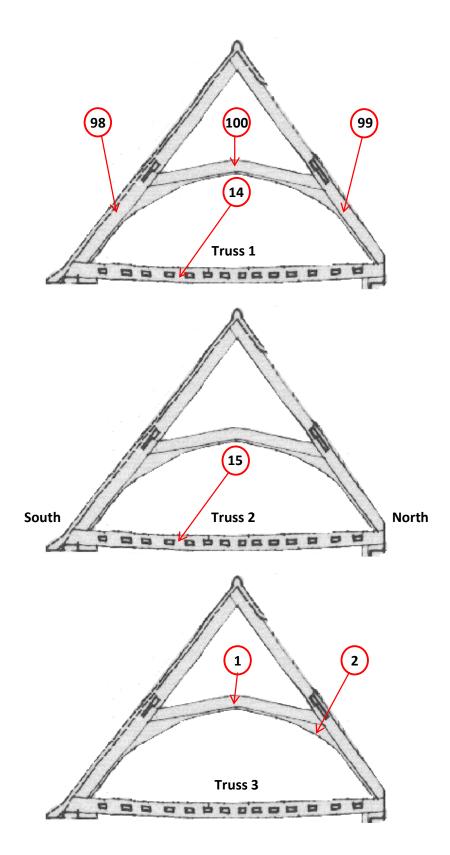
c: Roof trusses above the Great Chamber and Presence Chamber to locate sampled timbers (after Ministry of Works Ancient Monuments Branch 1954)
